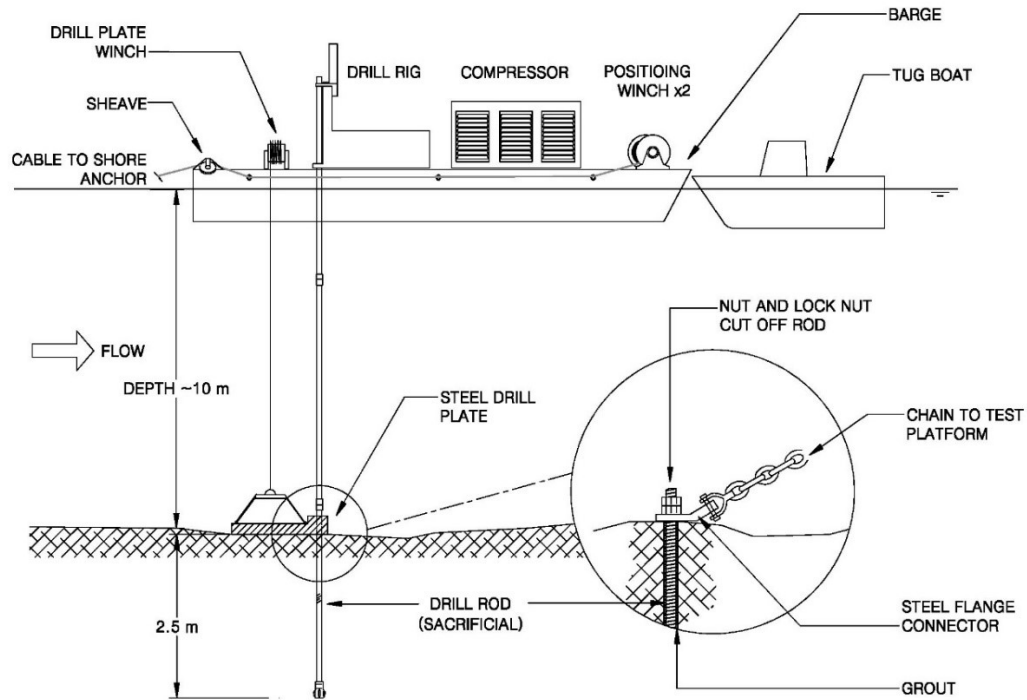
Simplified diagram for drilling barge showing essential rented equipment: two 2-ton positioning winches, drill plate winch, drill rig, compressor, tugboat for initial positioning and stability.
